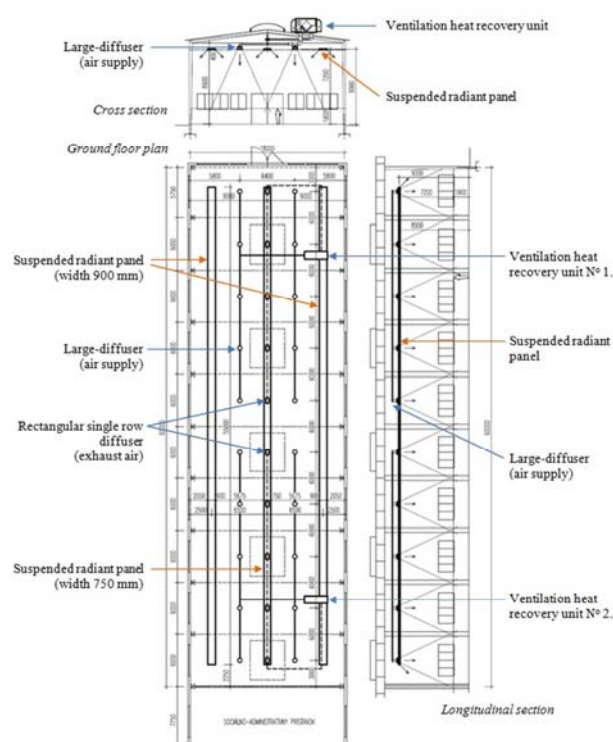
The ground floor plan, the cross and longitudinal section of an industrial building and a diagram of the combined system [6]
